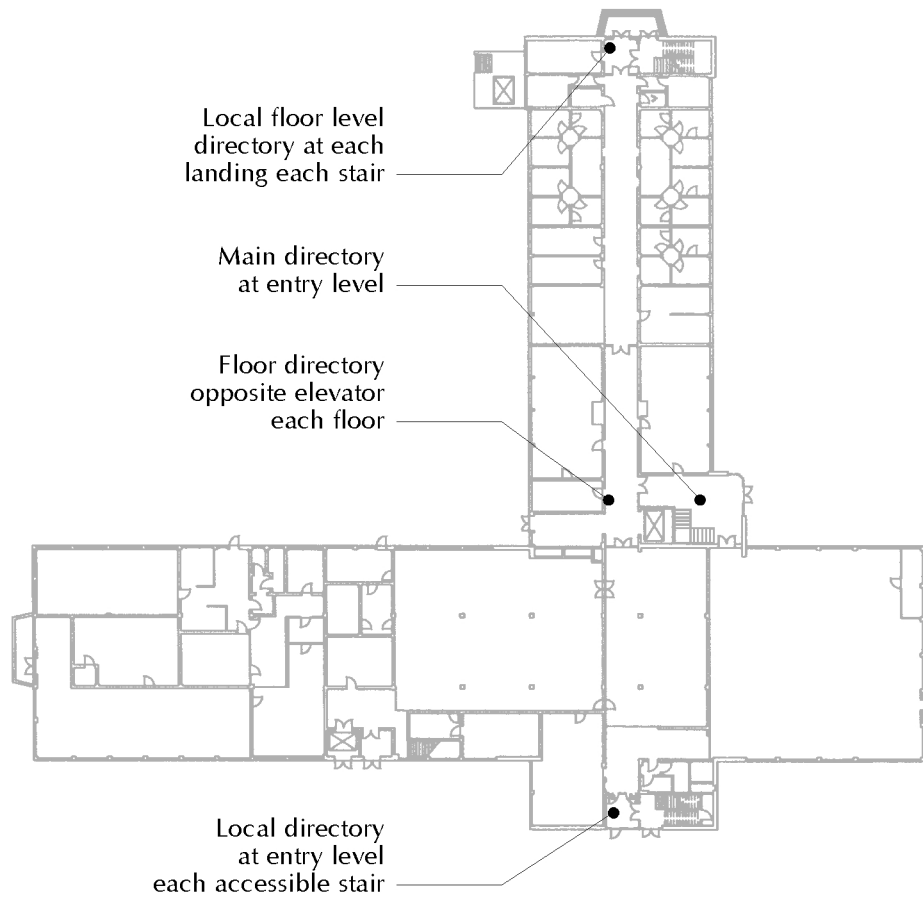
Heidelberg Hospital, Entry Floor Plan of Building 3617; showing typical location of primary signage elements.
